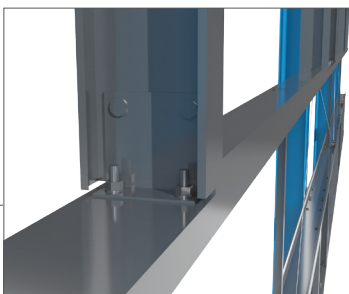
Detail of the window framing section connection by means of a connecting angle piece (TC). The same rules apply to the framing of door openings as for the window ones.
